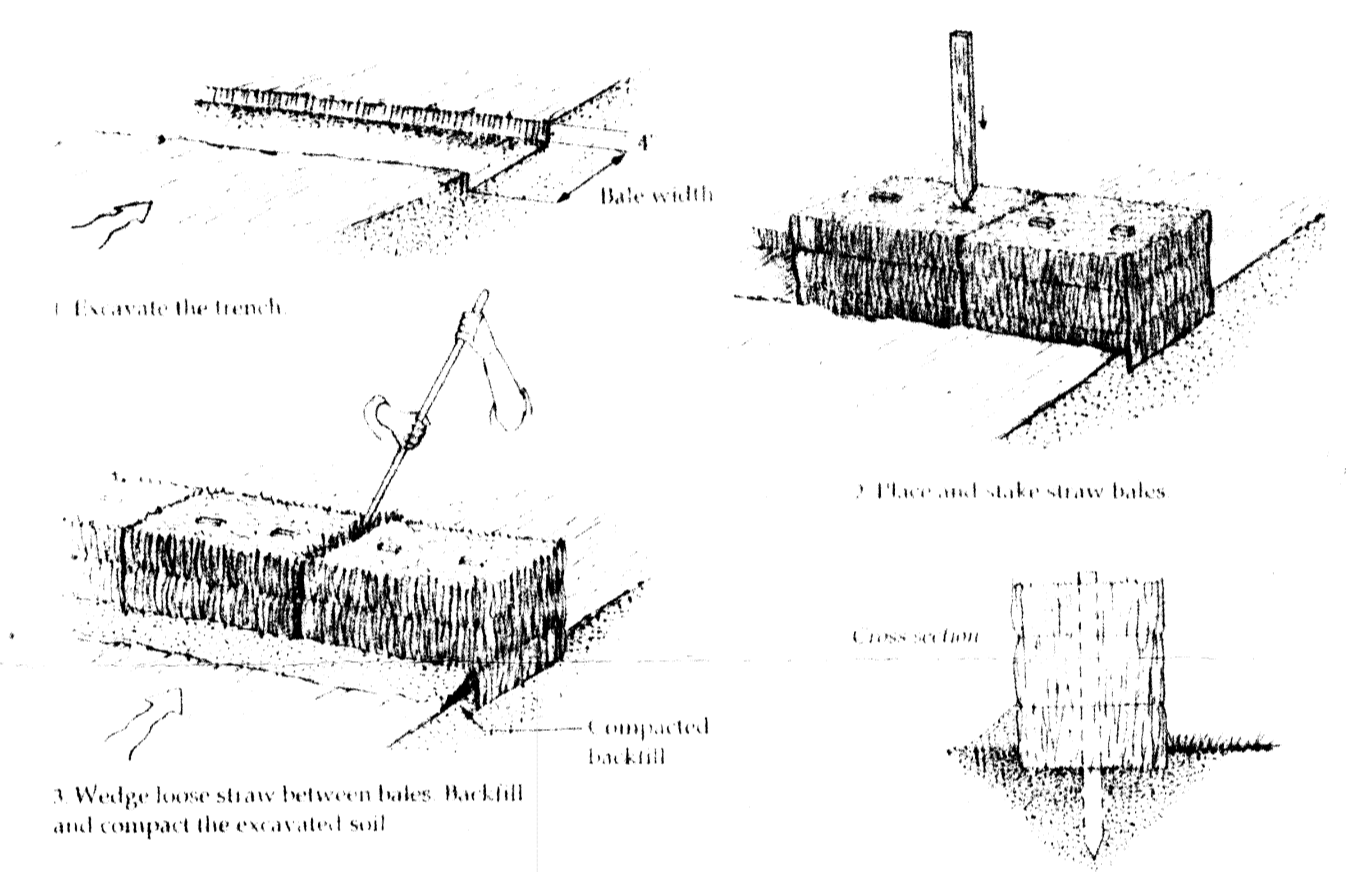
Placement and Construction of a Straw Bale Barrier
